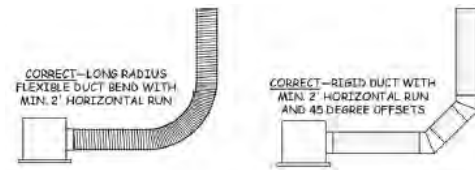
CORRECT INSTALLATION OF BENDS AND ELBOWS
